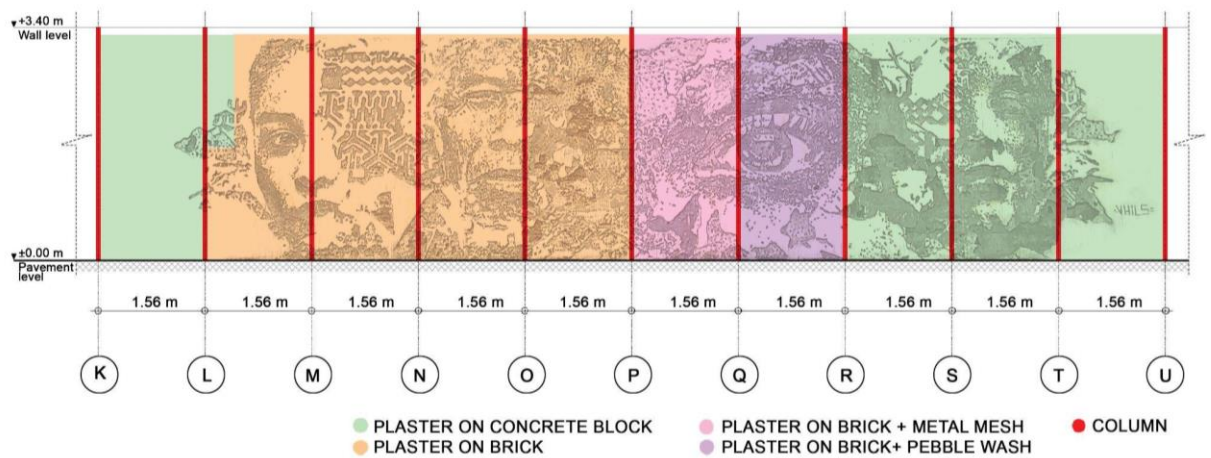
The diagram of plaster on masonry wall that divided into a small section by the column
